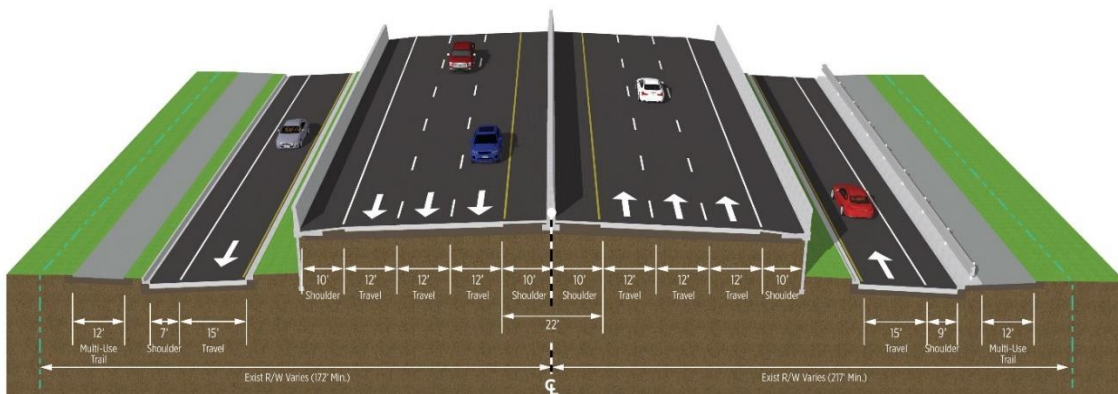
Segment 1 – Typical Section 3 from San Martin Blvd. to west end of Gandy bridges
